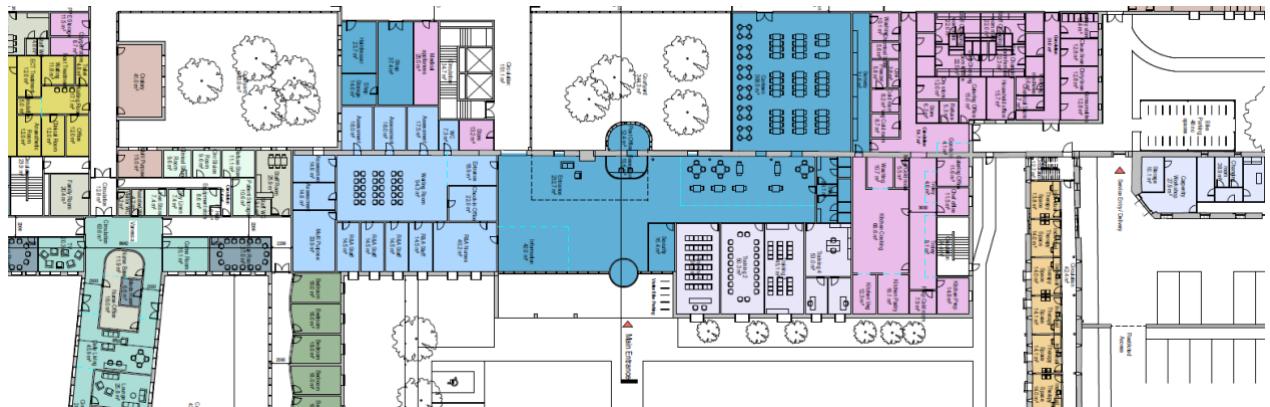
Proposed ground floor site plan excerpt. Source: TOT Architects.
